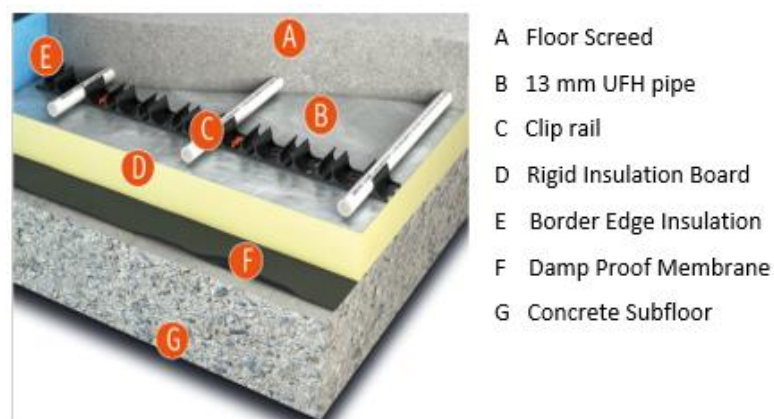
Underfloor Heating (Floor Heating Systems Guide, 2022)
